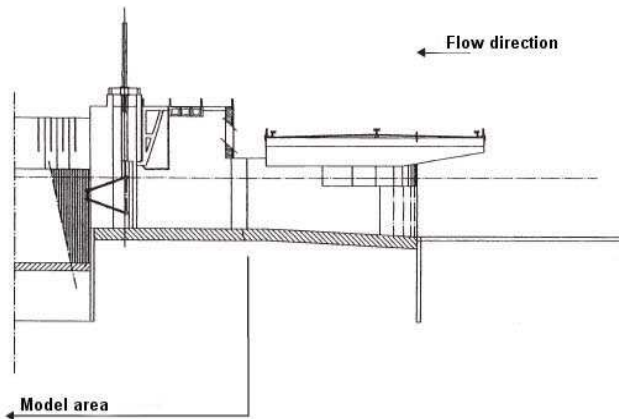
Case study: bed protection downstream of sluice; vertical section of sluice
